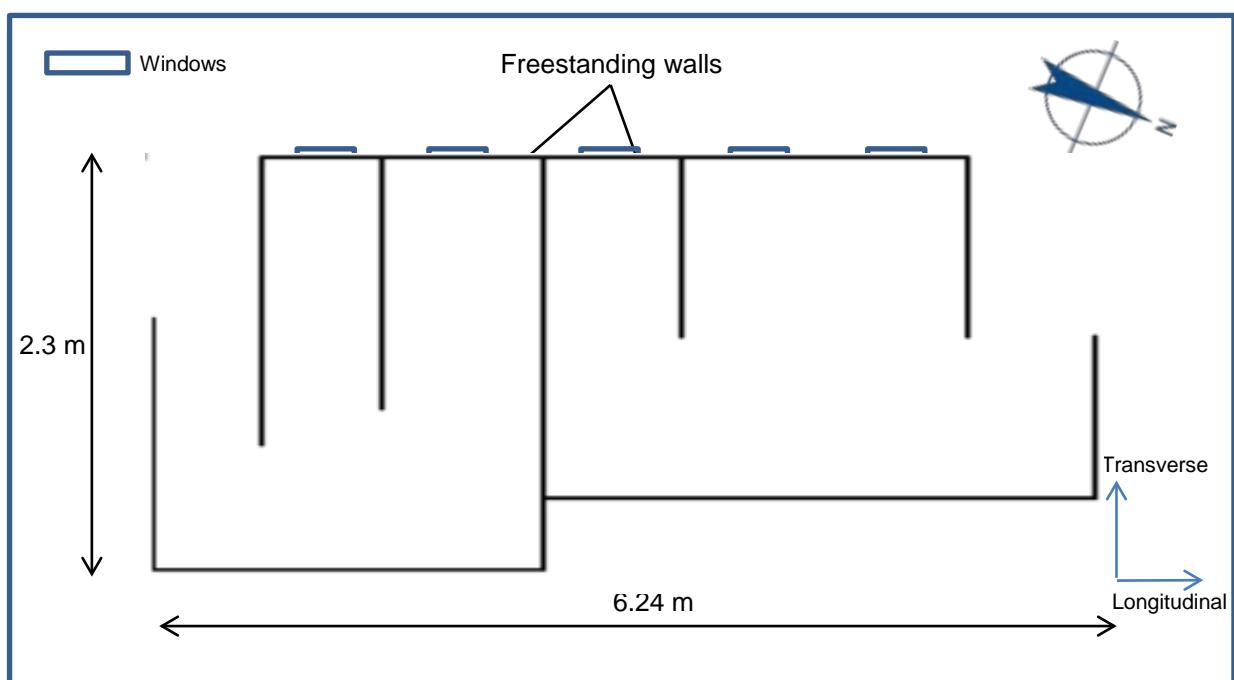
Le Bons Bay Domain Toilet Floor Plan
